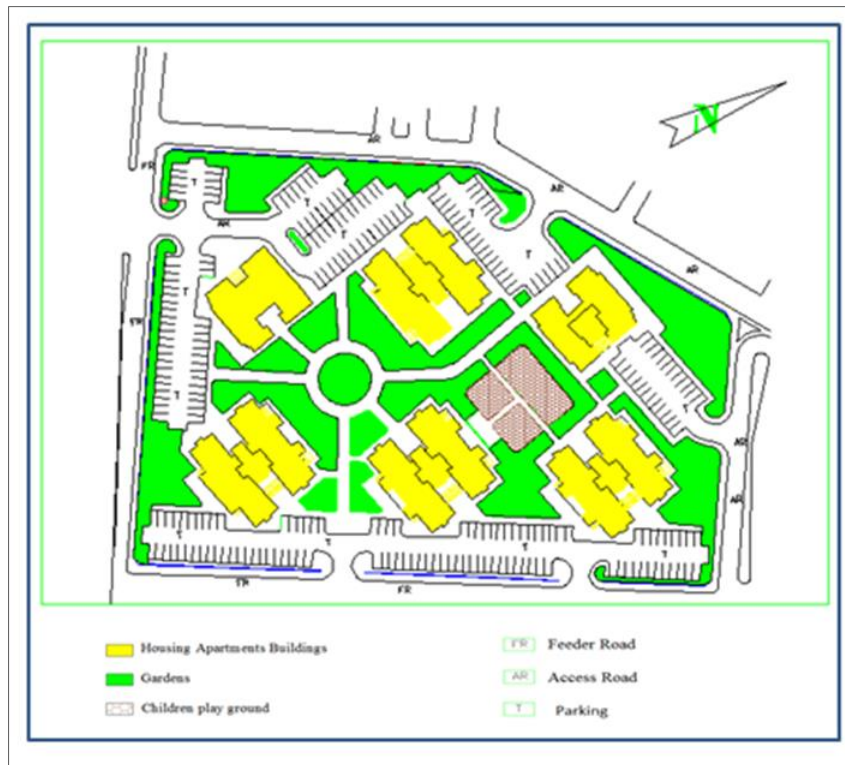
Layout plan of the Souq Atolata (North) Housing Project
